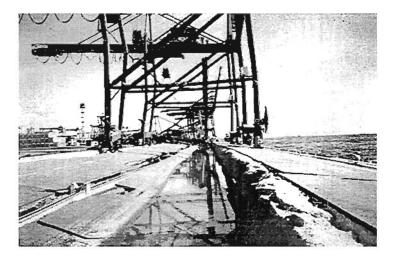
Cranes in Rokko Island were pulled apart by the lateral movement of concrete caisson walls
